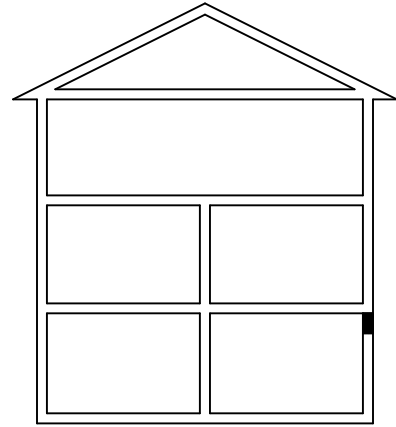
ROOF, CEILING AND TWO CENTER-BEARING FLOORS
